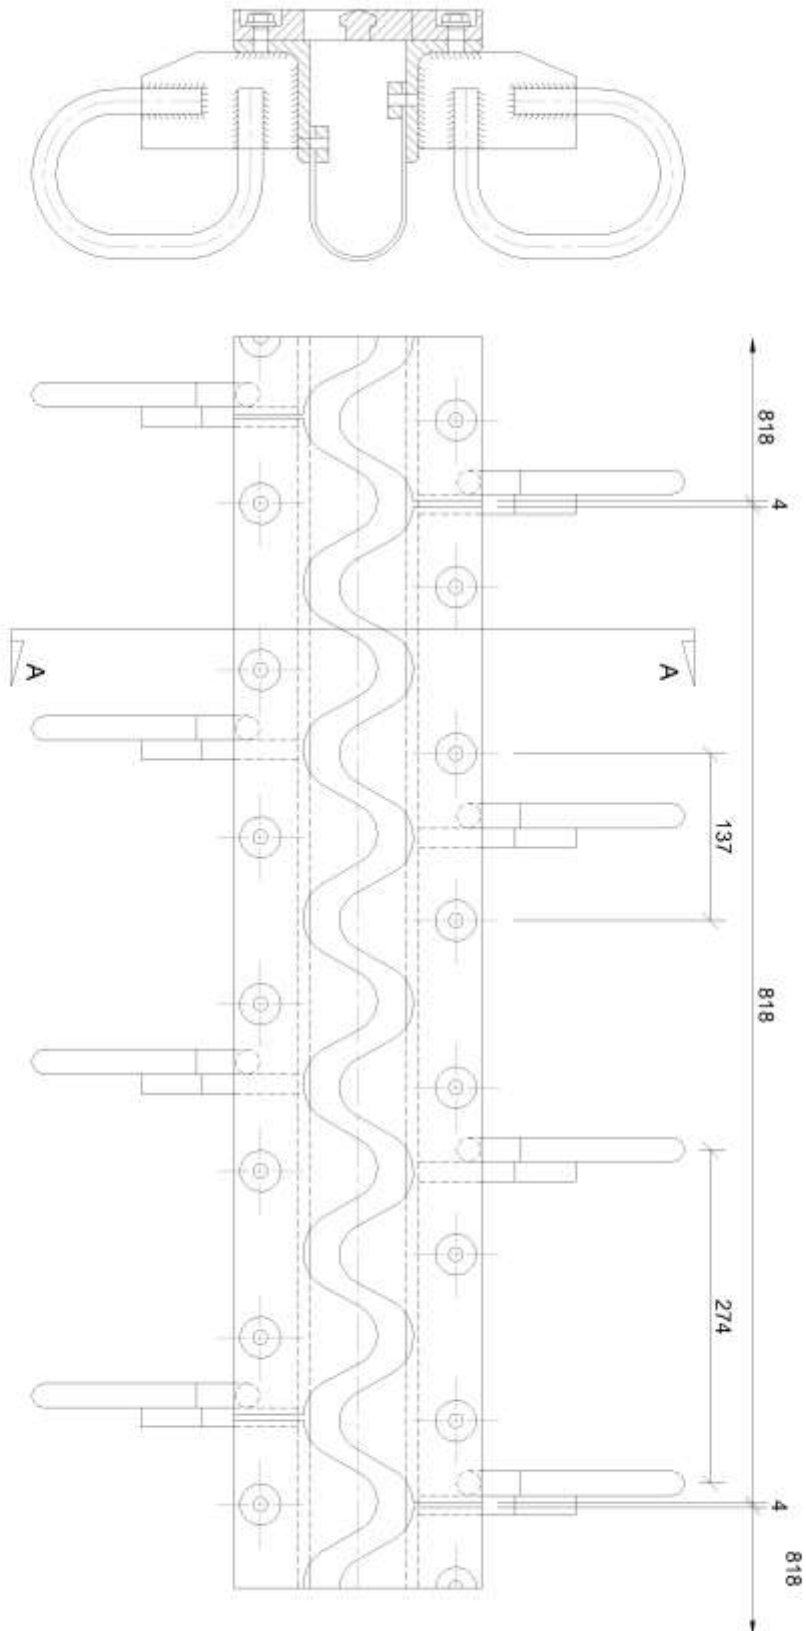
Typical section A-A and top view for Tensa Finger expansion joints ranging from RSFD-B 60 to RSFD-B 140
